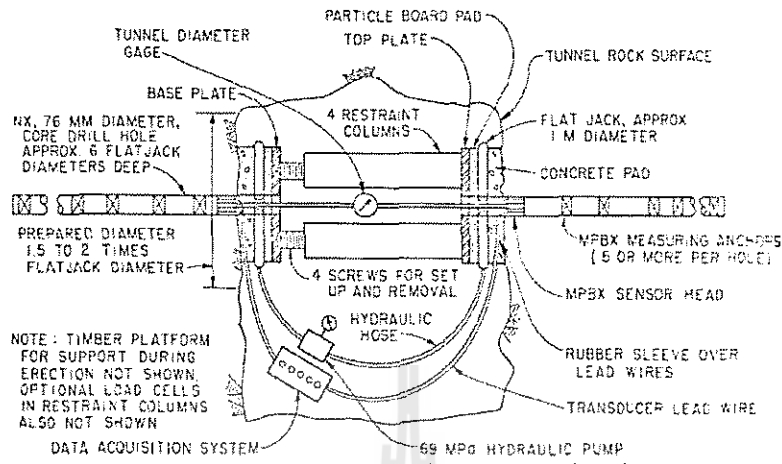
Typical Flexible Plate Bearing Test Setup Schematic
